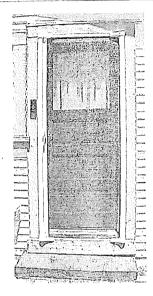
\_2561 View: Rear entry door Photo Date: July, 2020 Camera Facing: ENE
